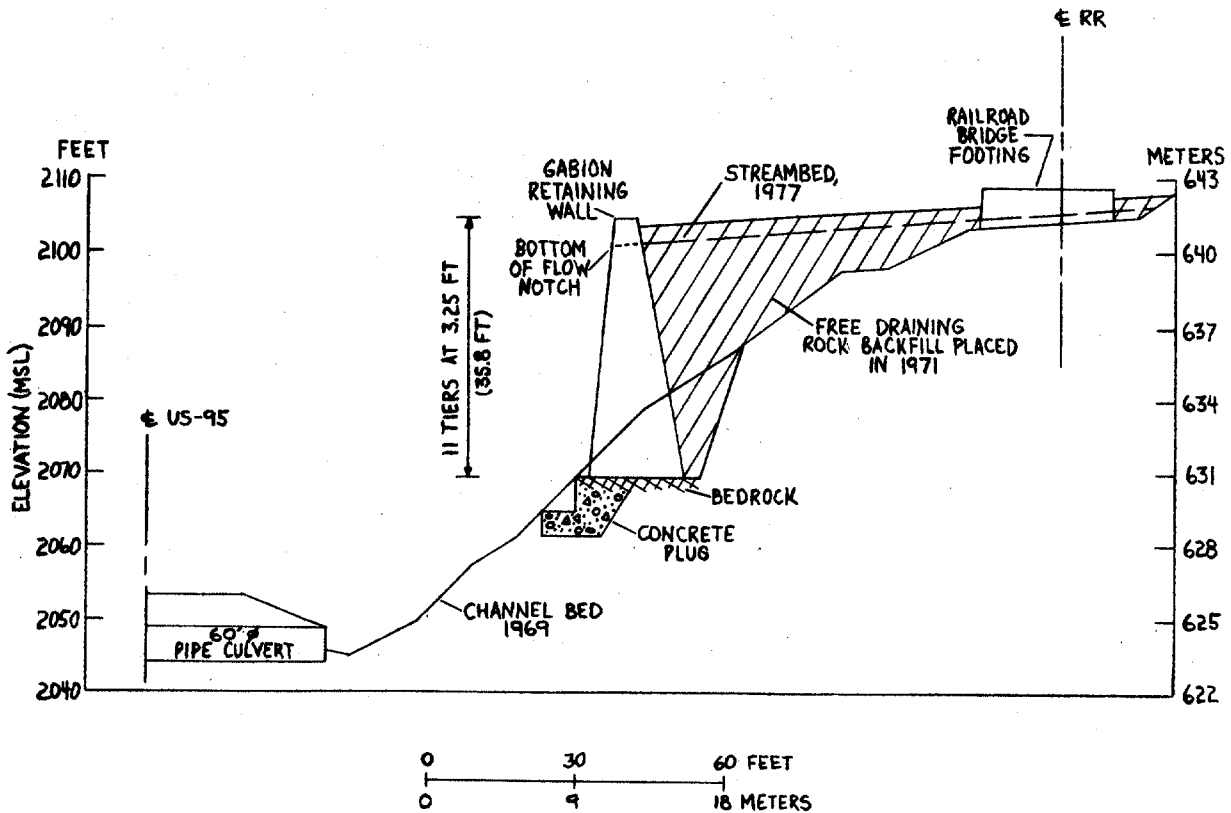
Profile along center of channel between railroad and highway after construction of check dam in 1971.
